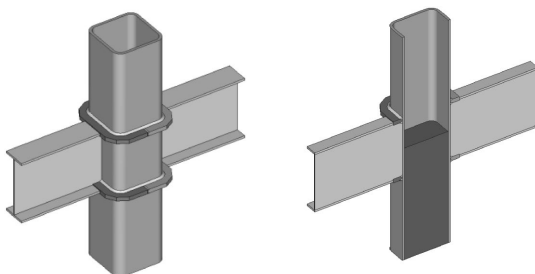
Design technology for column to beam connection of square hollow section CFT columns
